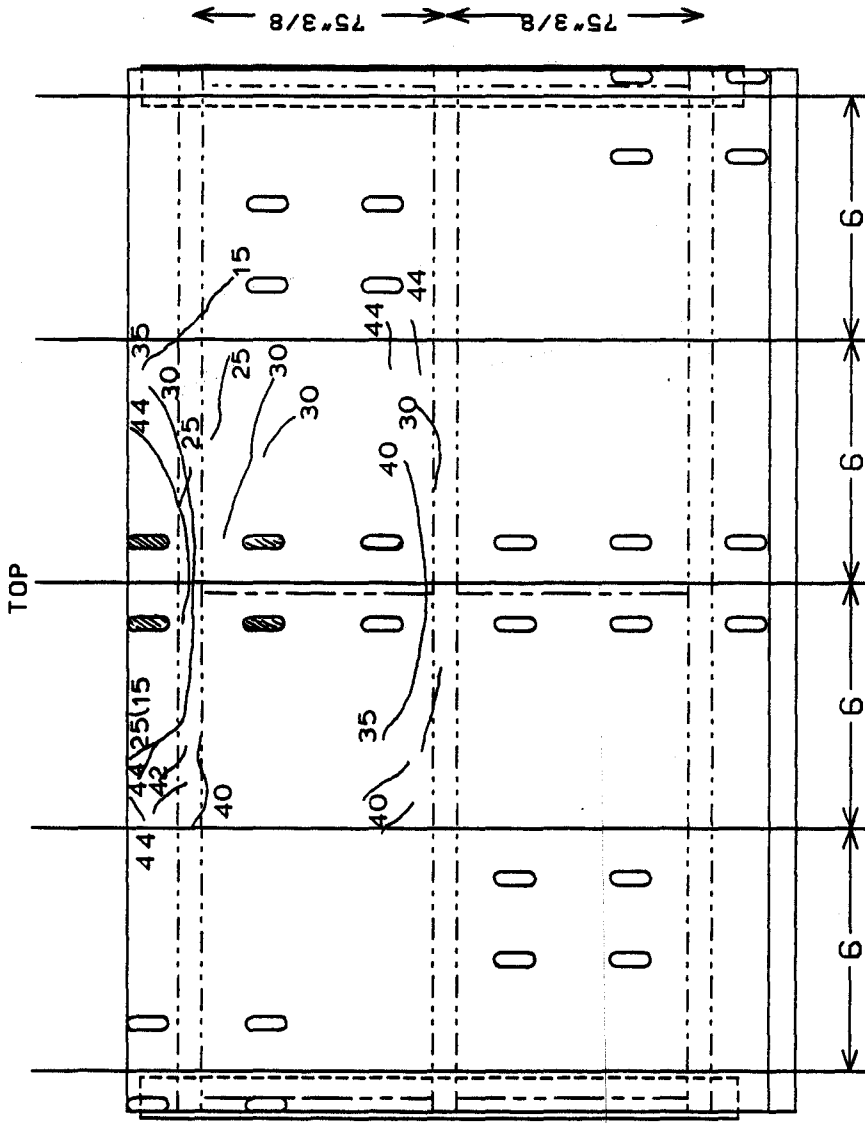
Top Cracking Pattern (Second Bridge - Test No. 2)
